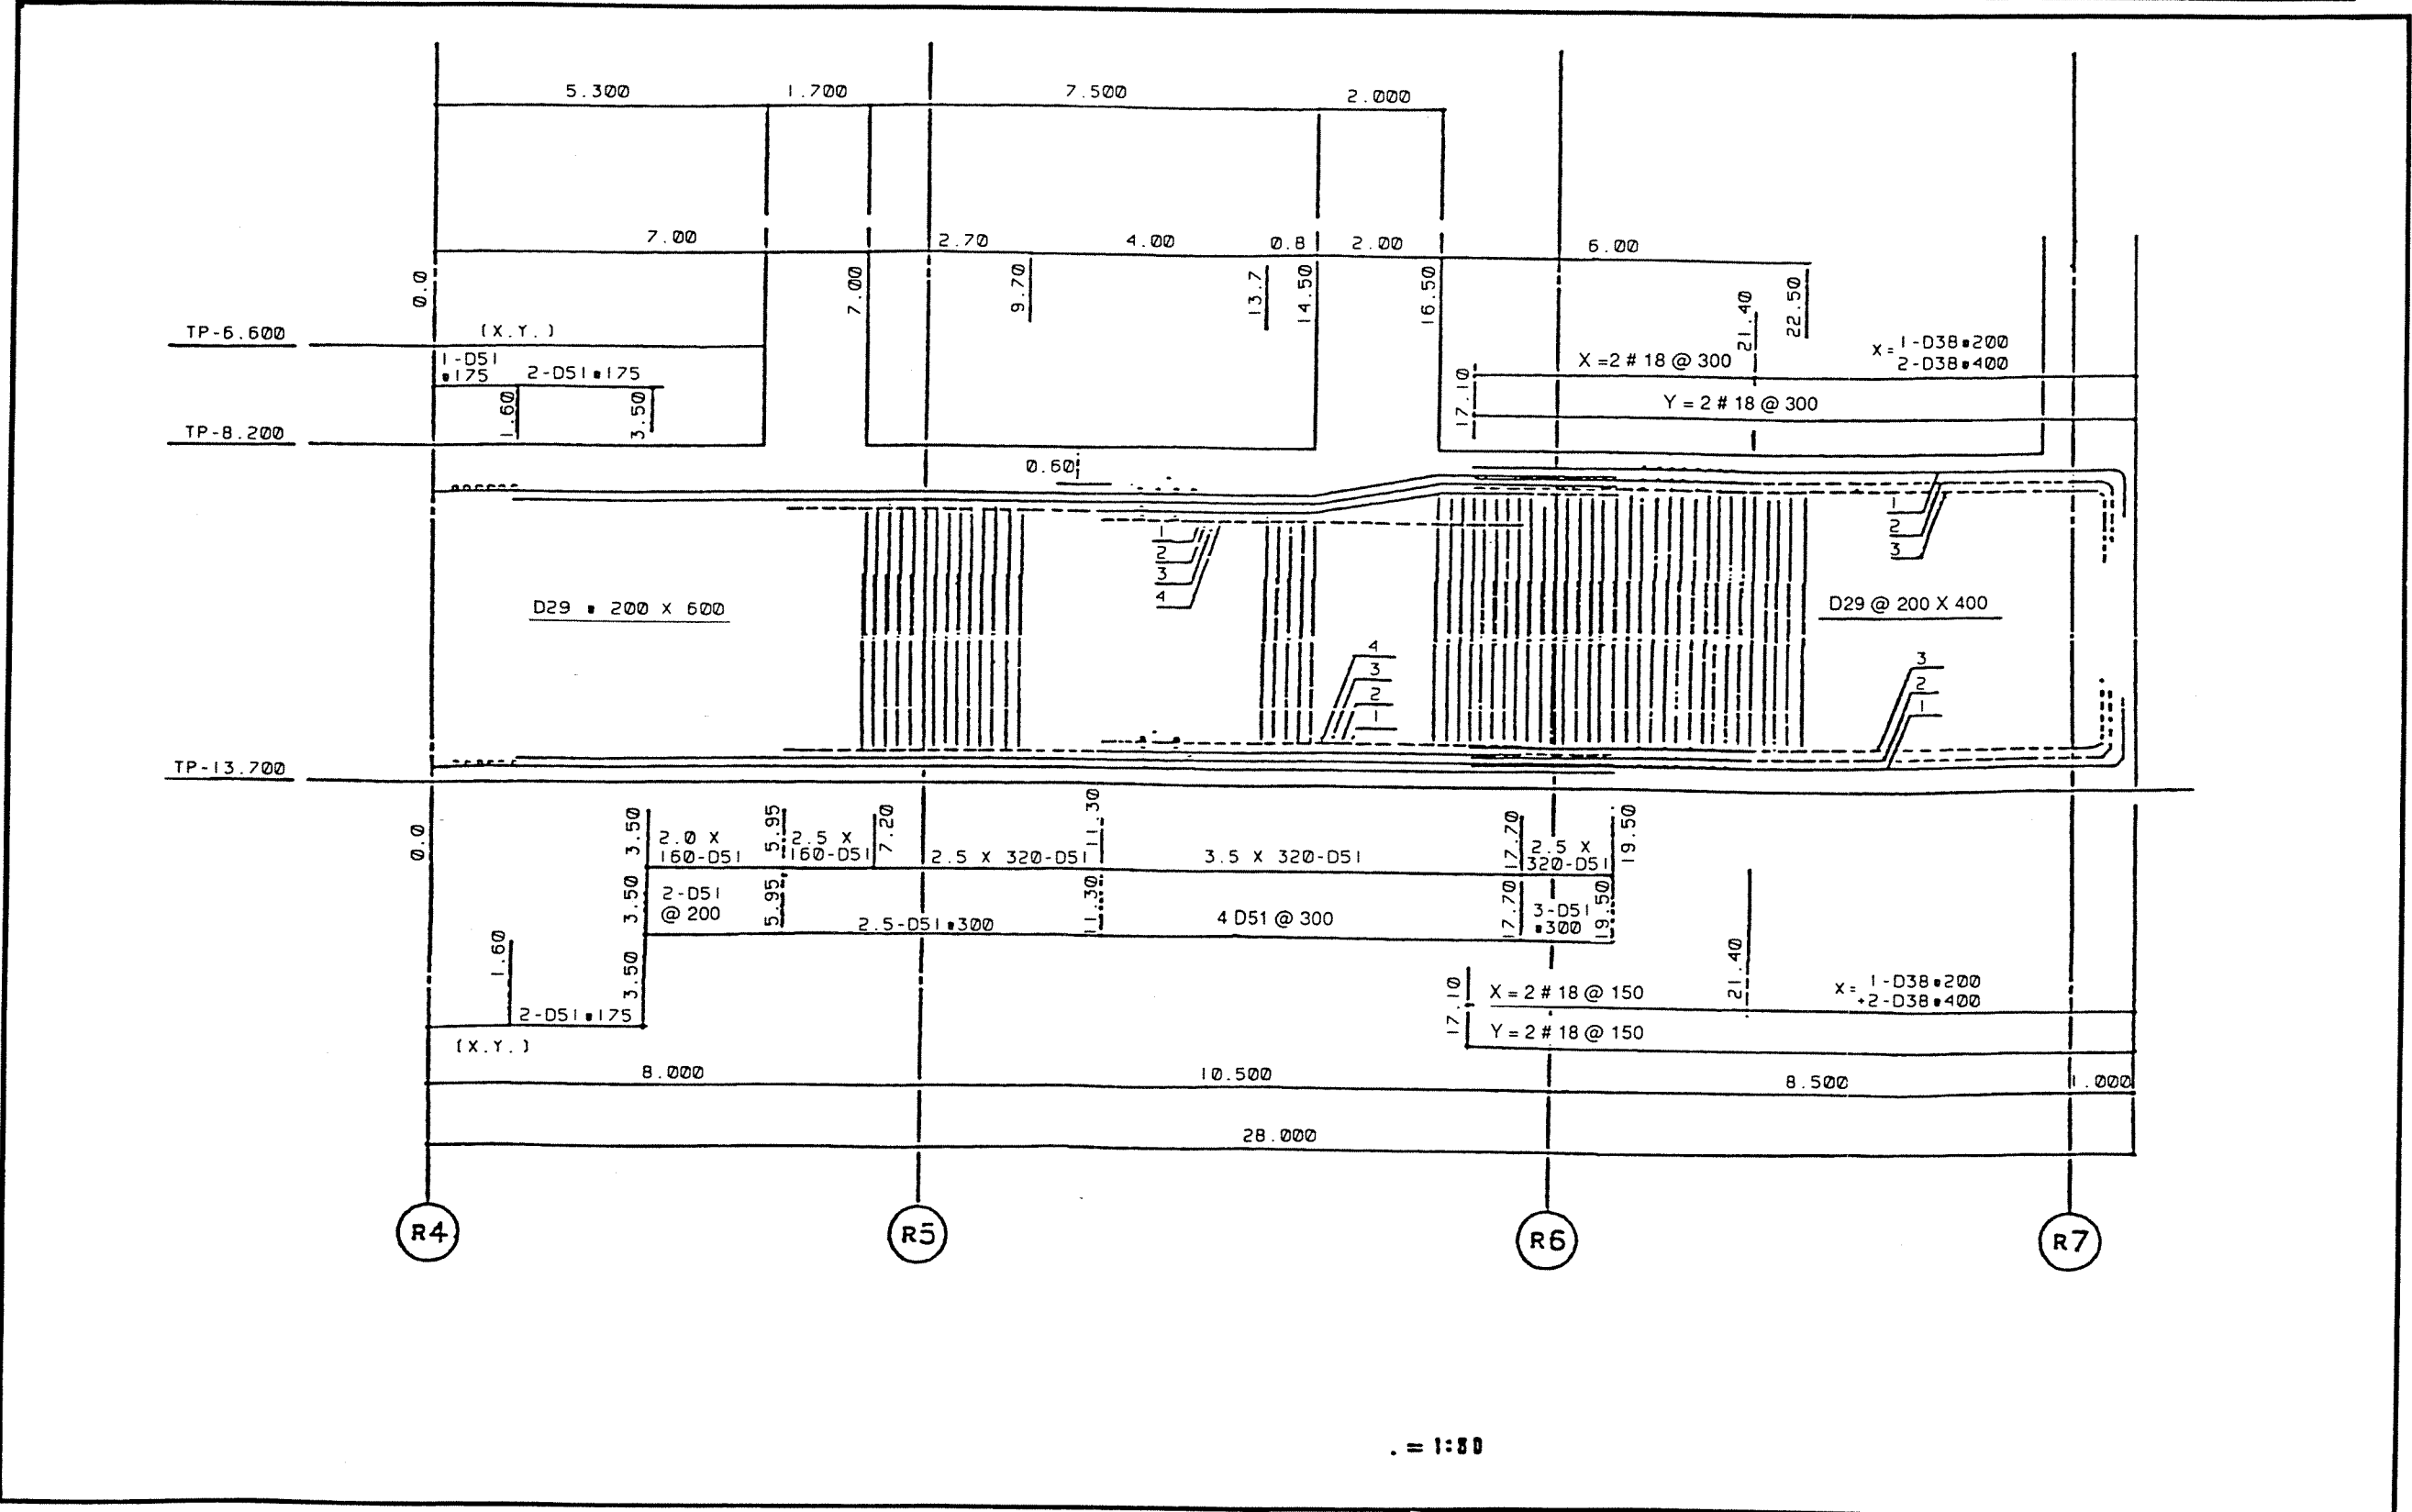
H.1-34 REACTOR BUILDING FOUNDATION REINFORCEMENT - SHEET 1
